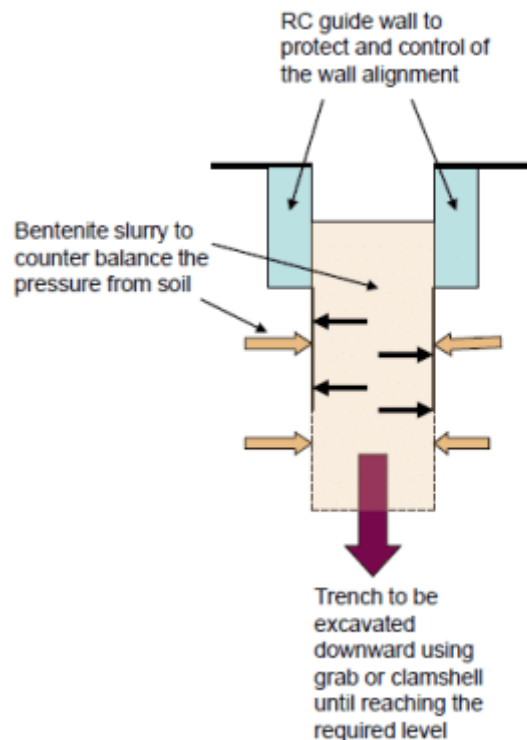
Guide Wall Constructed to Prevent Soil Collapse during Trenching
